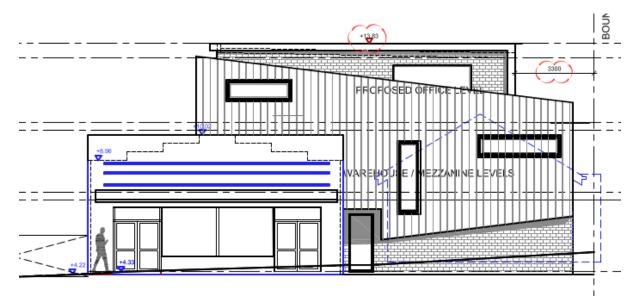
Street elevation of the proposed development (source: iDraft Architects, dated 27/10/2020)
